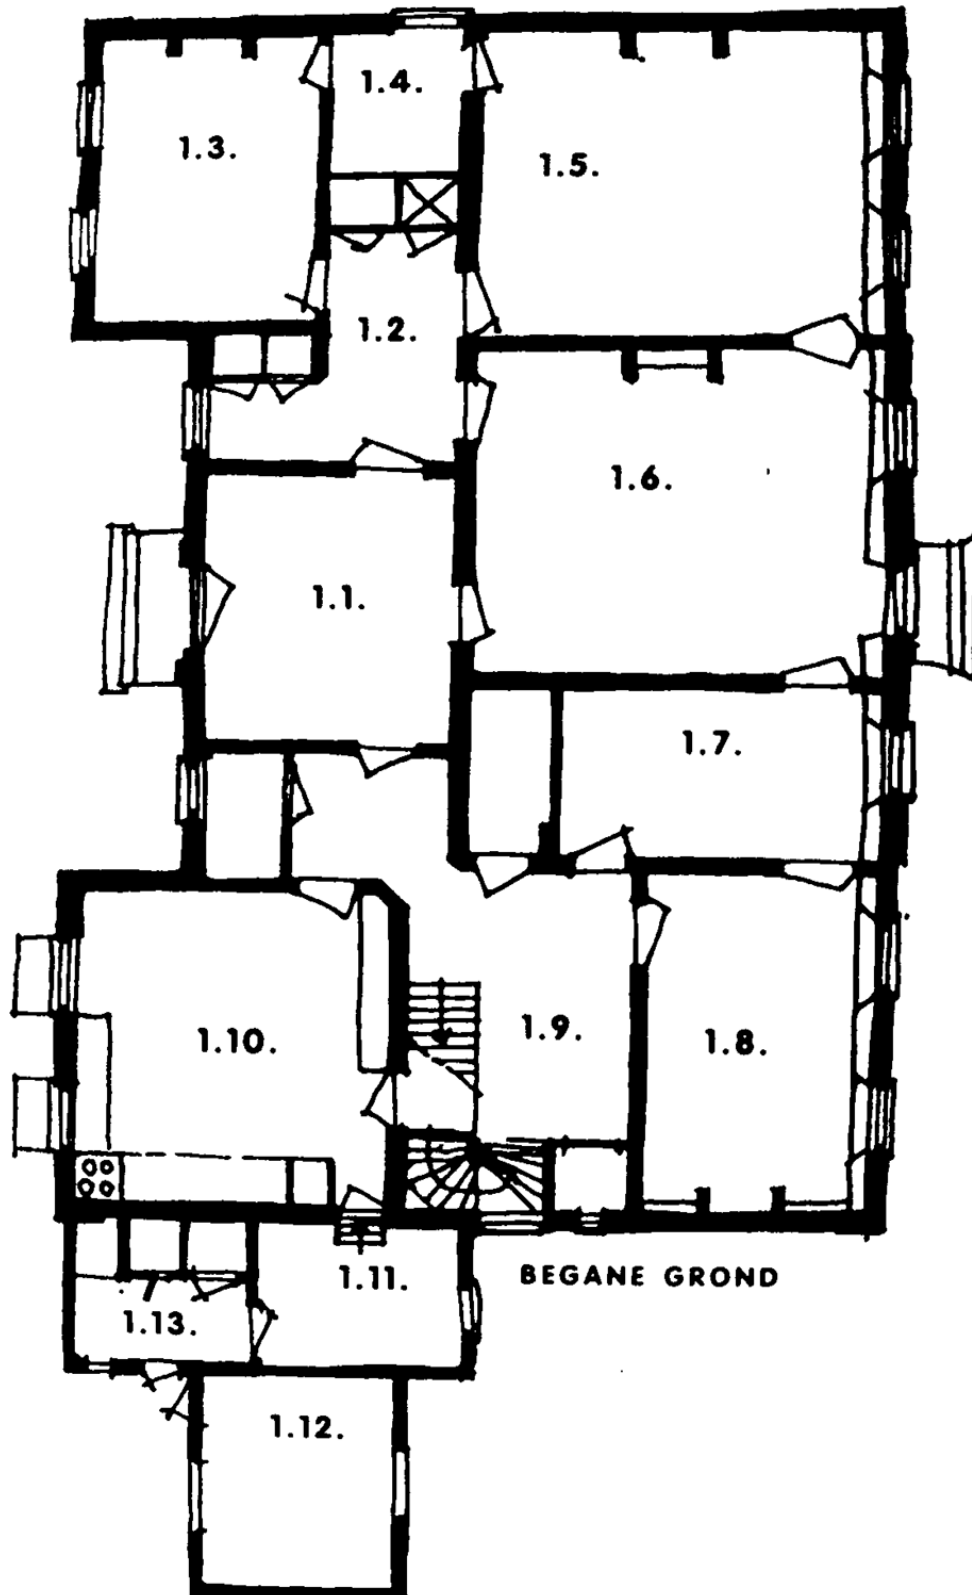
Floorplan ground floor of Oud-Amelisweerd © Paul Meurs.
